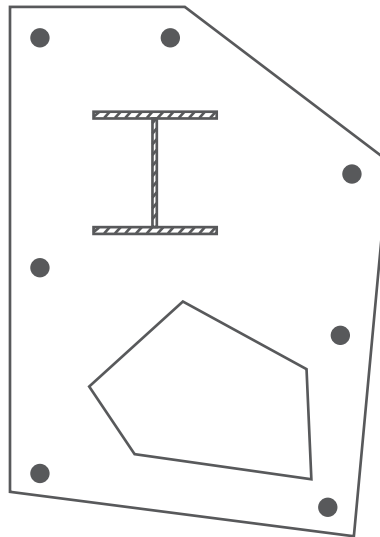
An irregular column with elements of I-section, reinforcing bars and concrete
